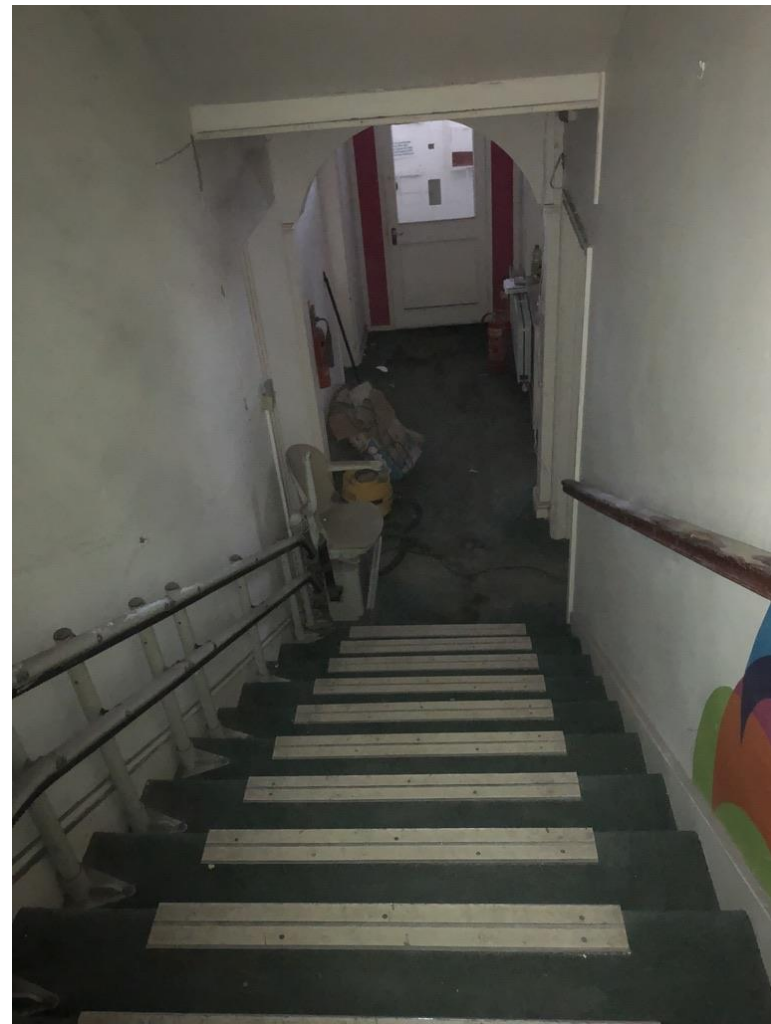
View towards the front door from the first floor half landing, the modern additional vestibule door is to be removed. Modern fittings including stair lift to be removed to de-clutter the stairwell.
